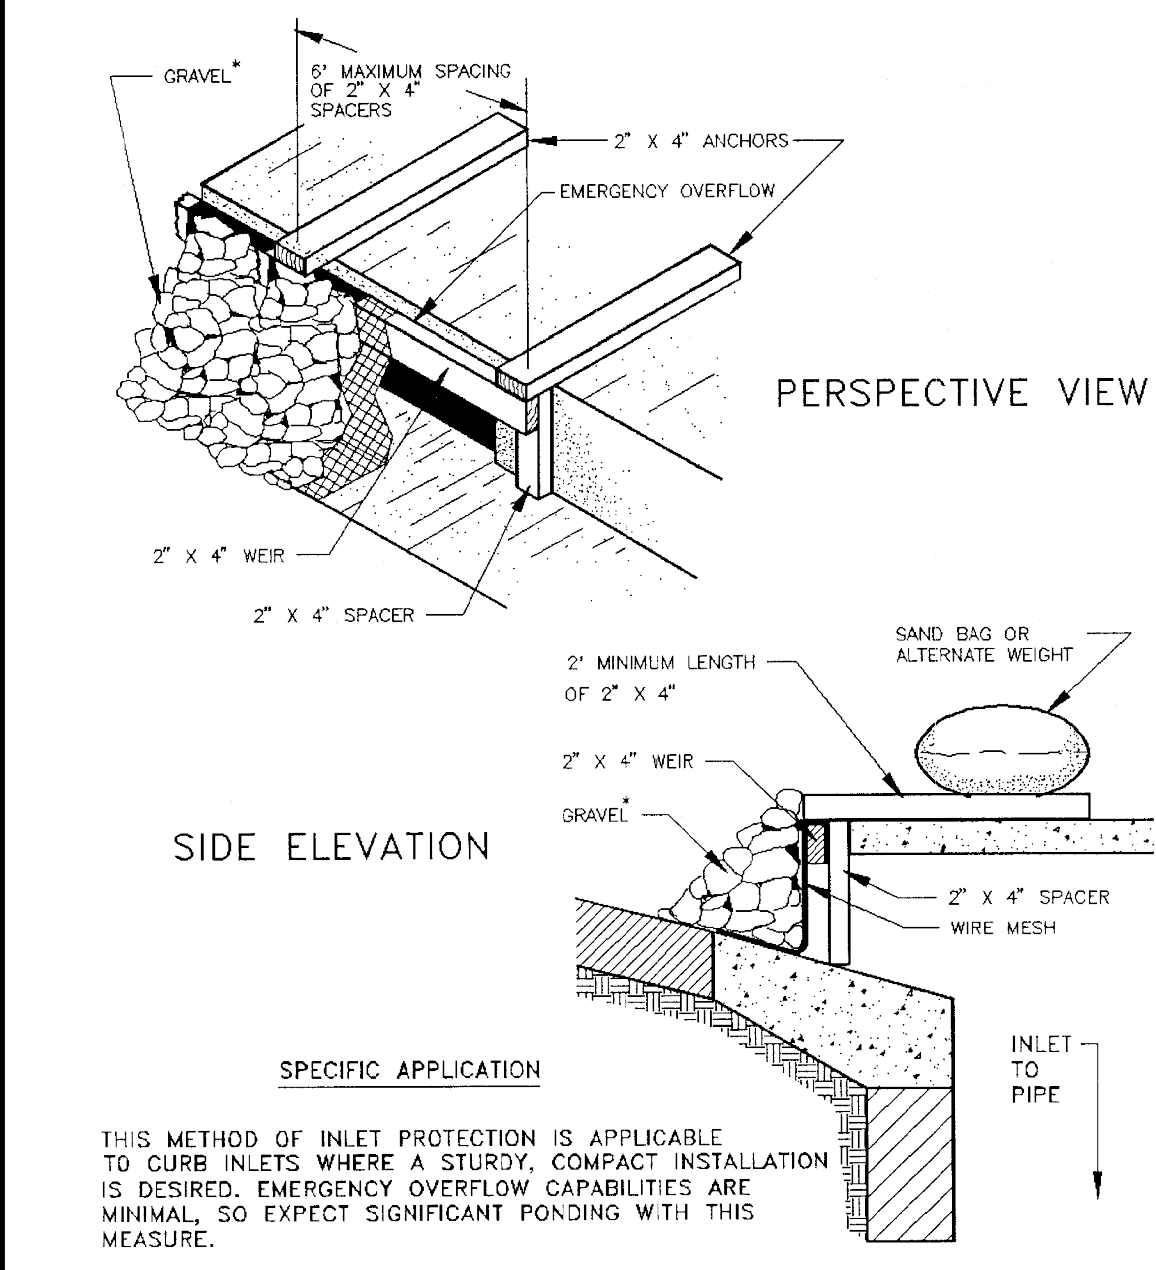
Wooden Weir Curb Inlet Protection (VA Dept of Conservation, 1992)
